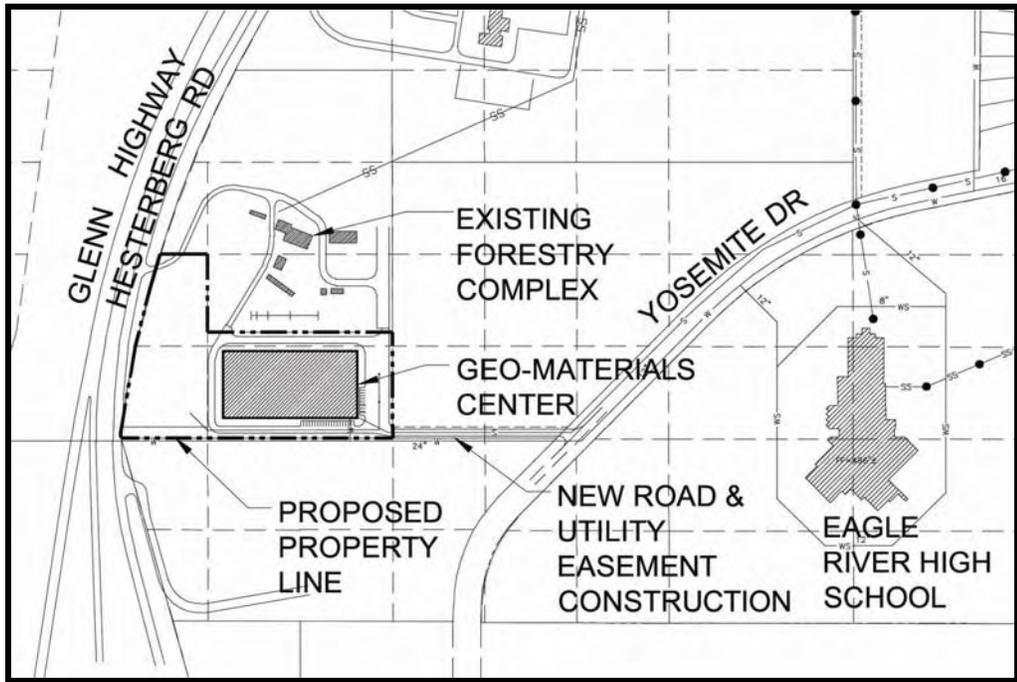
Site Plan (Option 3) Access from Yosemite Drive
